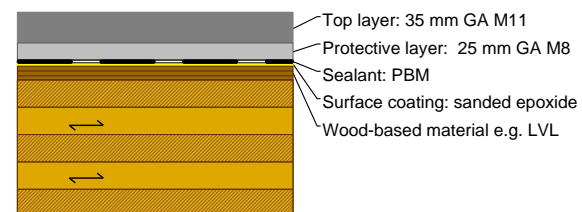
Sketch of a classical system with no shear connection between asphalt and bridge deck
